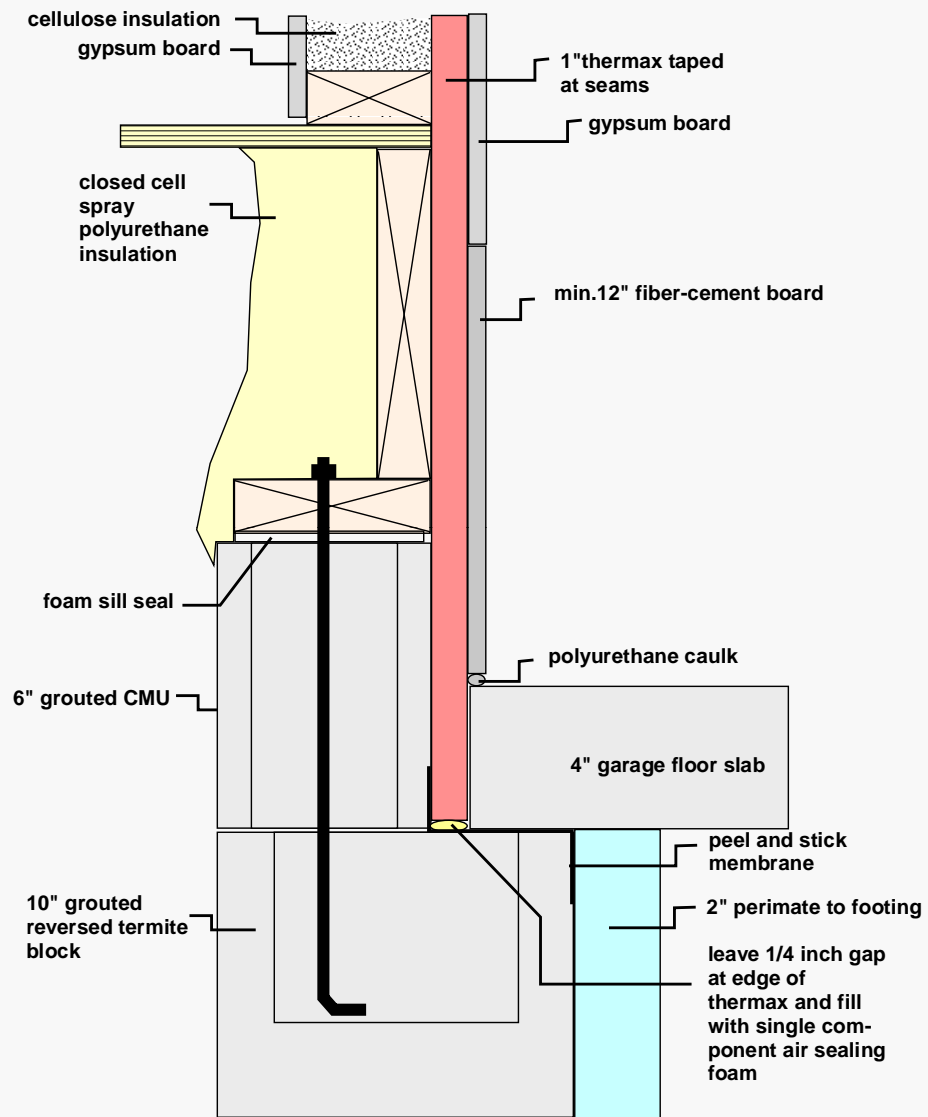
Intersection of basement wall, garage floor and garage/house wall.
